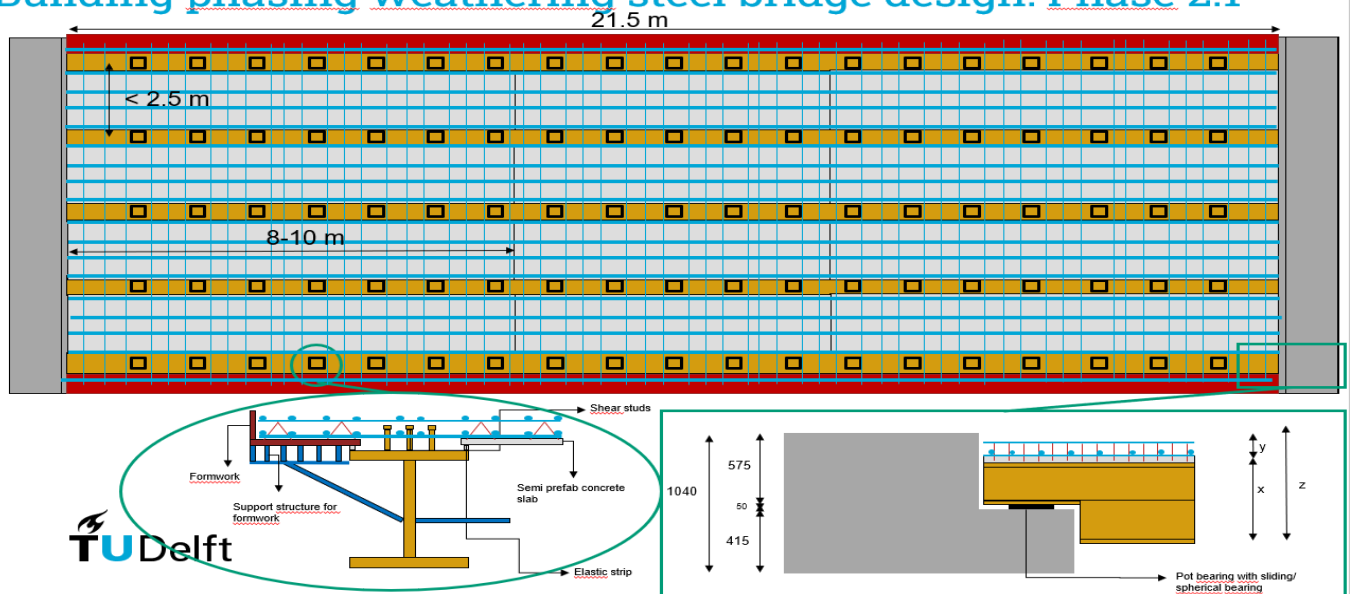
phase 2.1 placing of the formwork elements and the reinforcement
